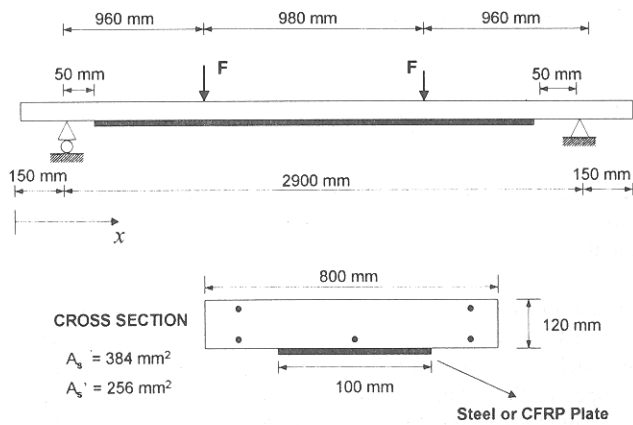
Test Setup for Shallow RC Beams with Steel or CFRP Plates
